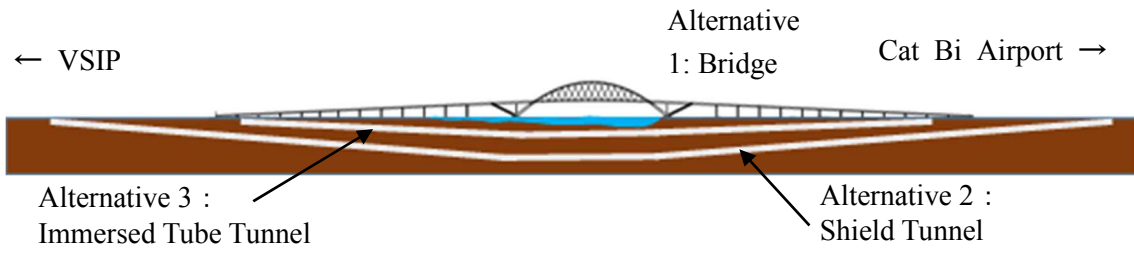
1 Alternative Closing Method of Nguyen Trai Bridge
